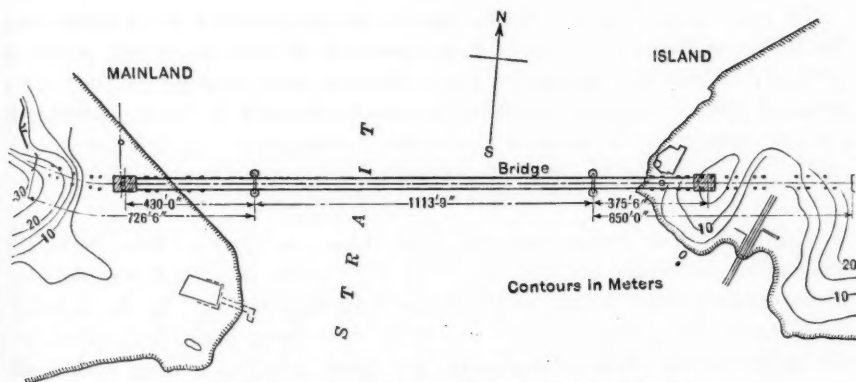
LOCATION PLAN OF THE FLORIANOPOLIS BRIDGE.
